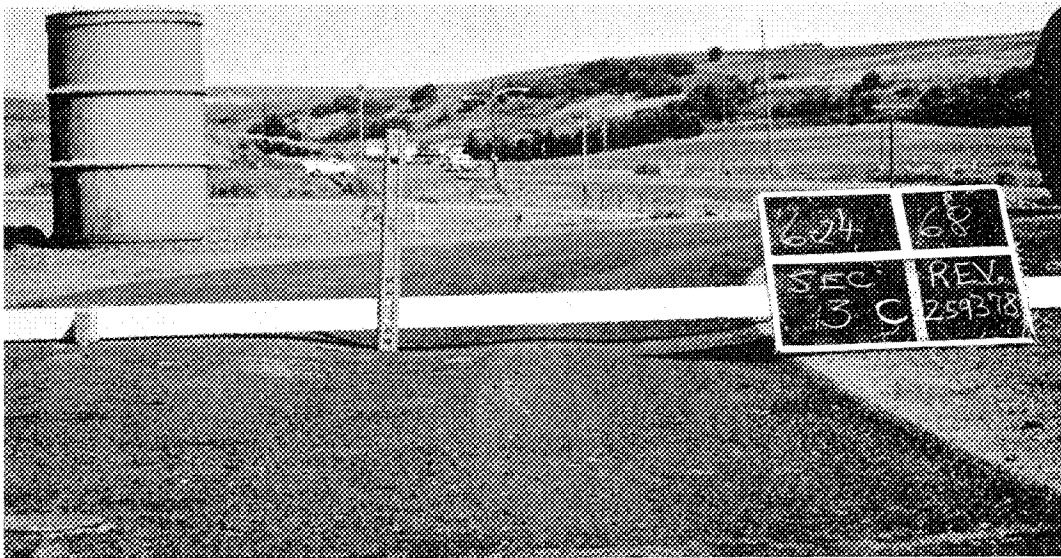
PERMANENT SETTLEMENT OF PAVEMENT IN SECTION 3 (3.5 INCHES OF ATB) AFTER 778,134 WHEEL LOAD APPLICATIONS ON JUNE 24, 1968.
